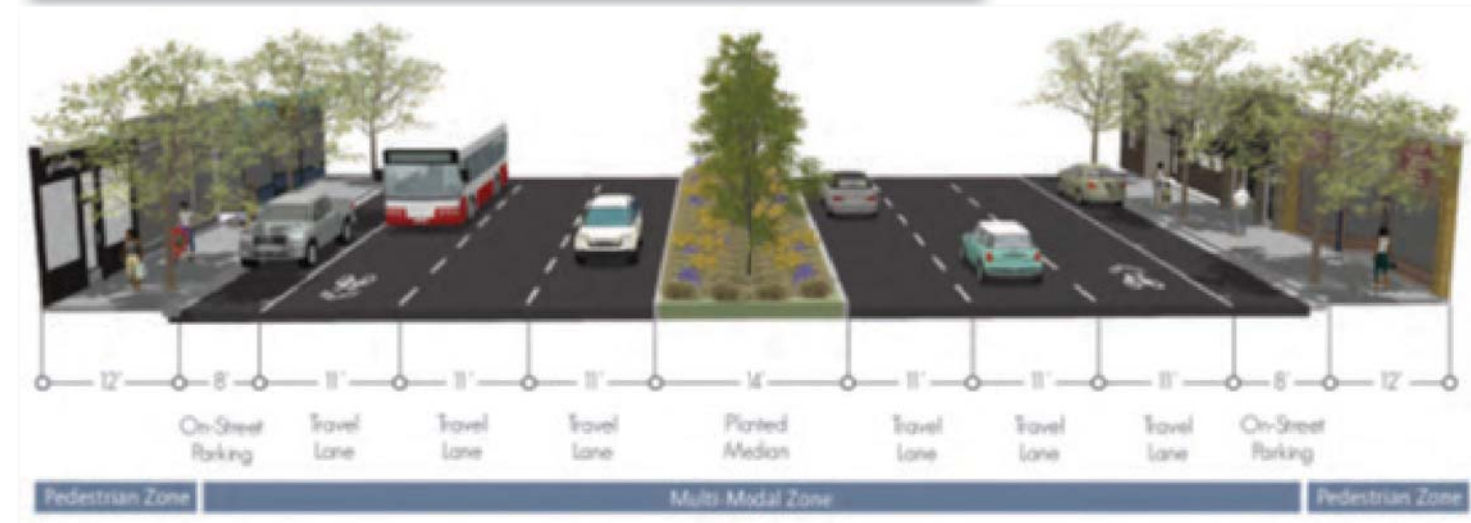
| Pedestrian Master Plan, Walkability Issues
